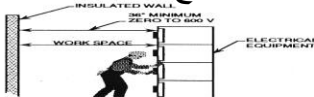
Clearance in front of electrical equipment with ungrounded wall opposite equipment.
